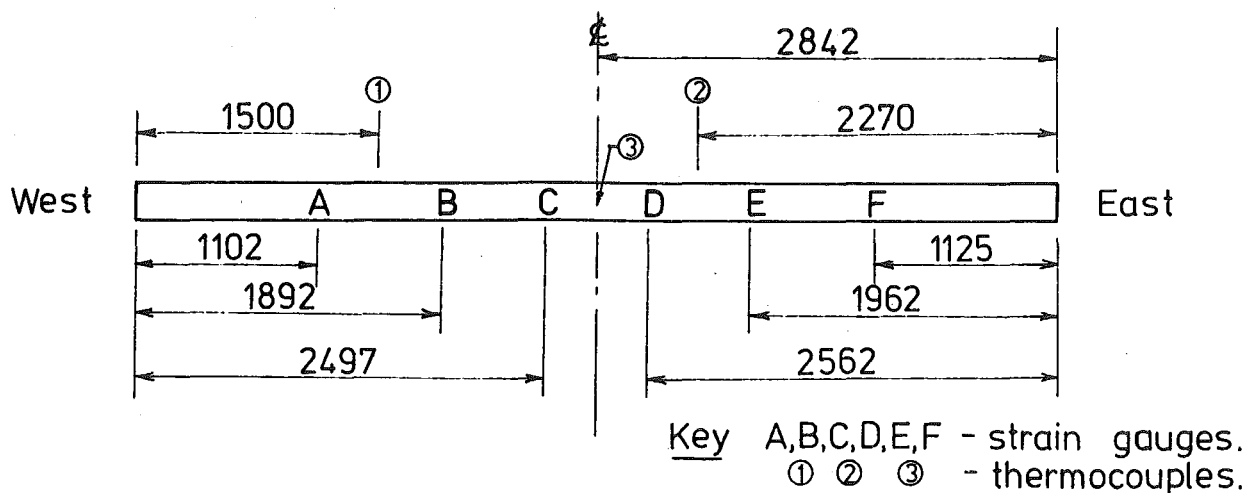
BEAMS ONE AND TWO - CASTING MOULD.
